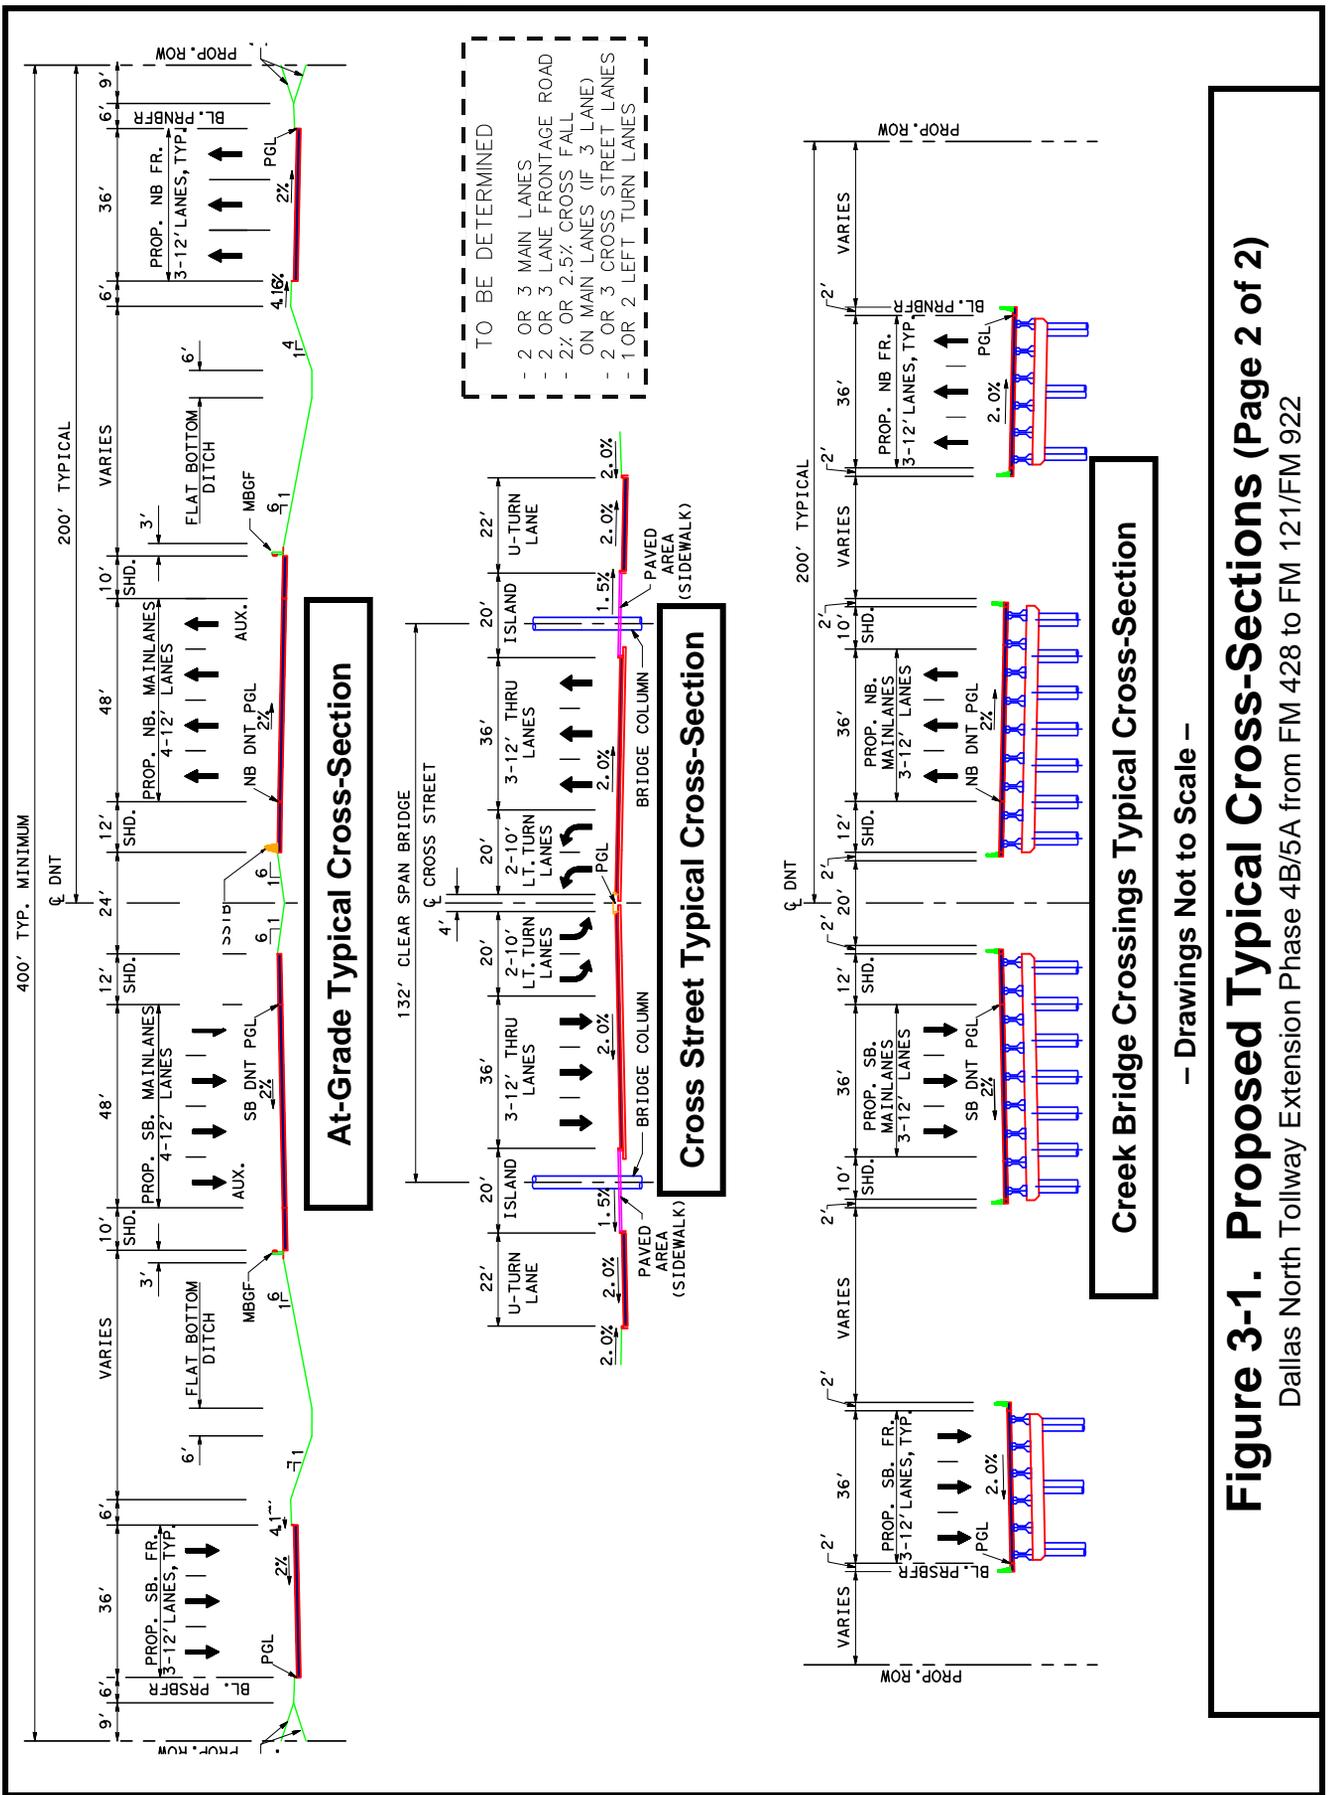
Proposed Typical Cross-Sections (Page 2 of 2)
